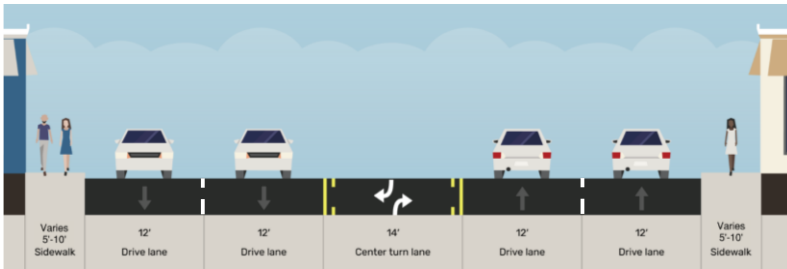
Typical Four-Lane Cross Section from Harbor Way to Kerber Drive Facing South
